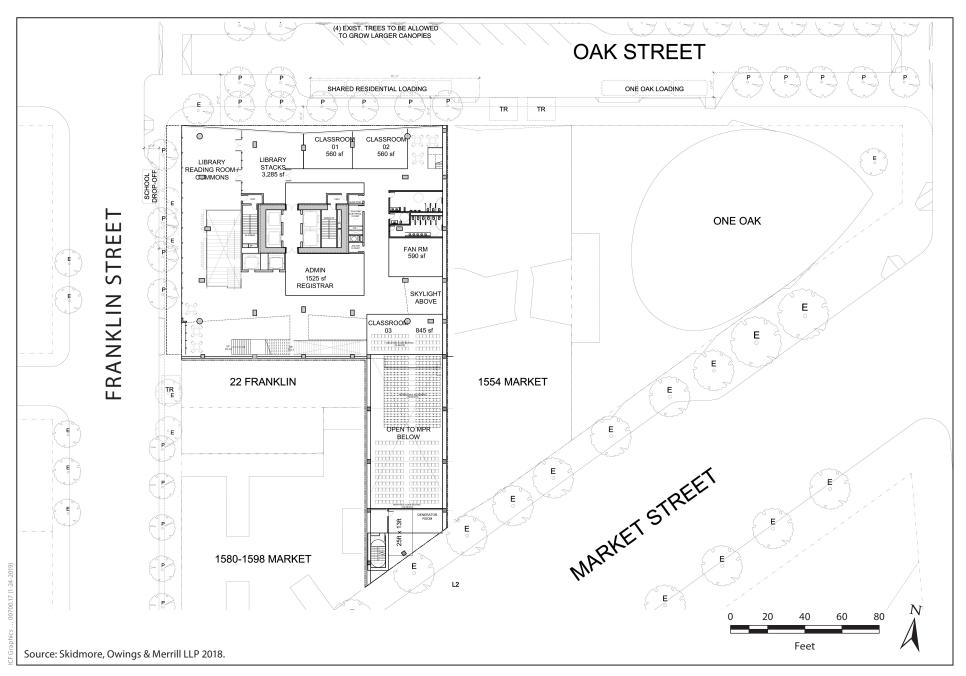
98 Franklin Street Project – Proposed 2nd Level Floor Plan
